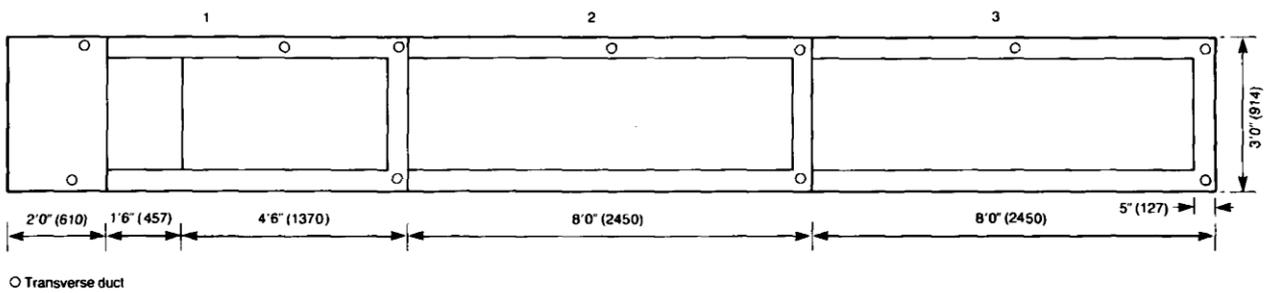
Longitudinal section of I-beam in Ynys-y-Gwas bridge (ID-1) (Woodward and Williams, 1988).
